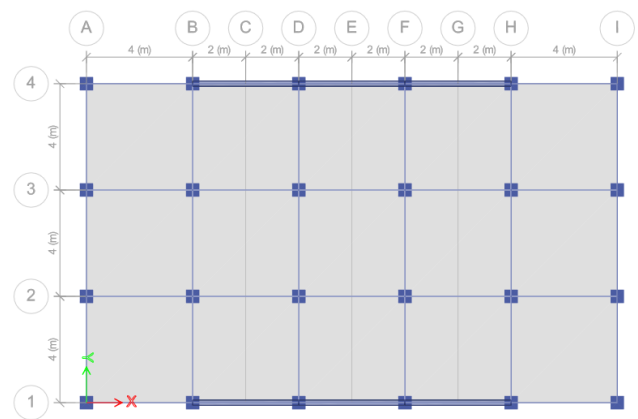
plan view of with adjacent shear wall R.C.C. Building
